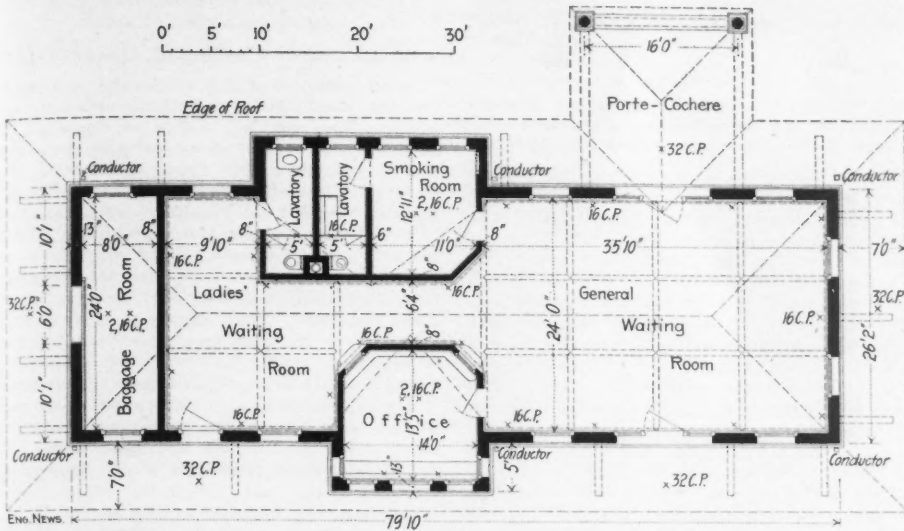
FLOOR PLAN OF PITTSBURG & LAKE ERIE R. R. PASSENGER STATION AT BEAVER, PA.
